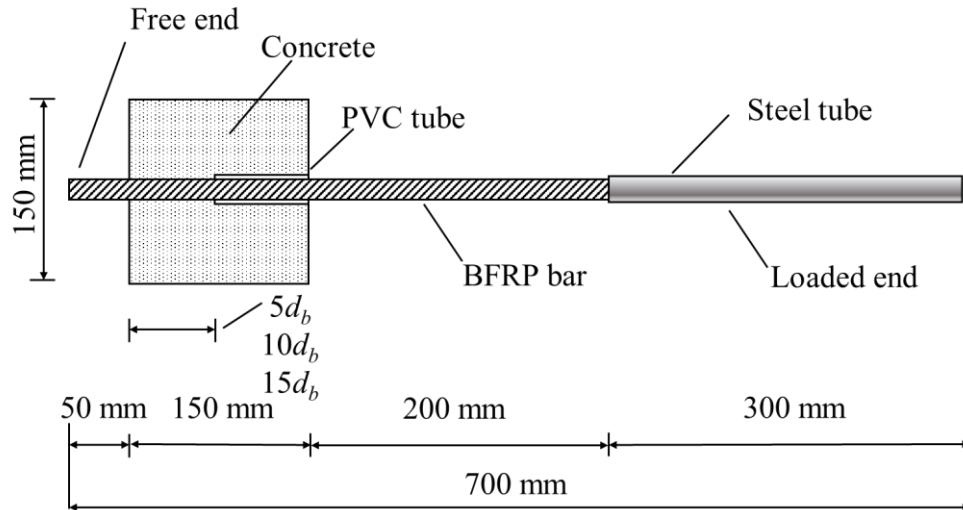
Longitudinal detail of pull-out test specimen.
